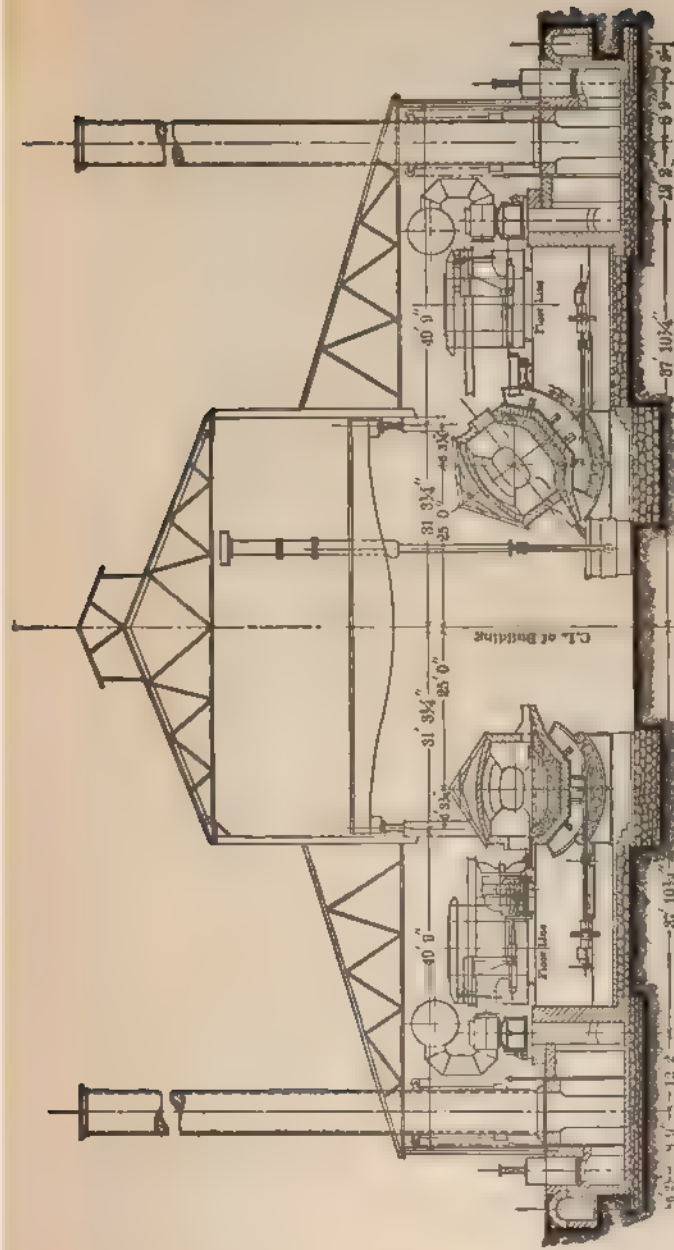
FIG. XXII.L.—CROSS-SECTION OF OPEN-HEARTH PLANT AT STEELTON.
